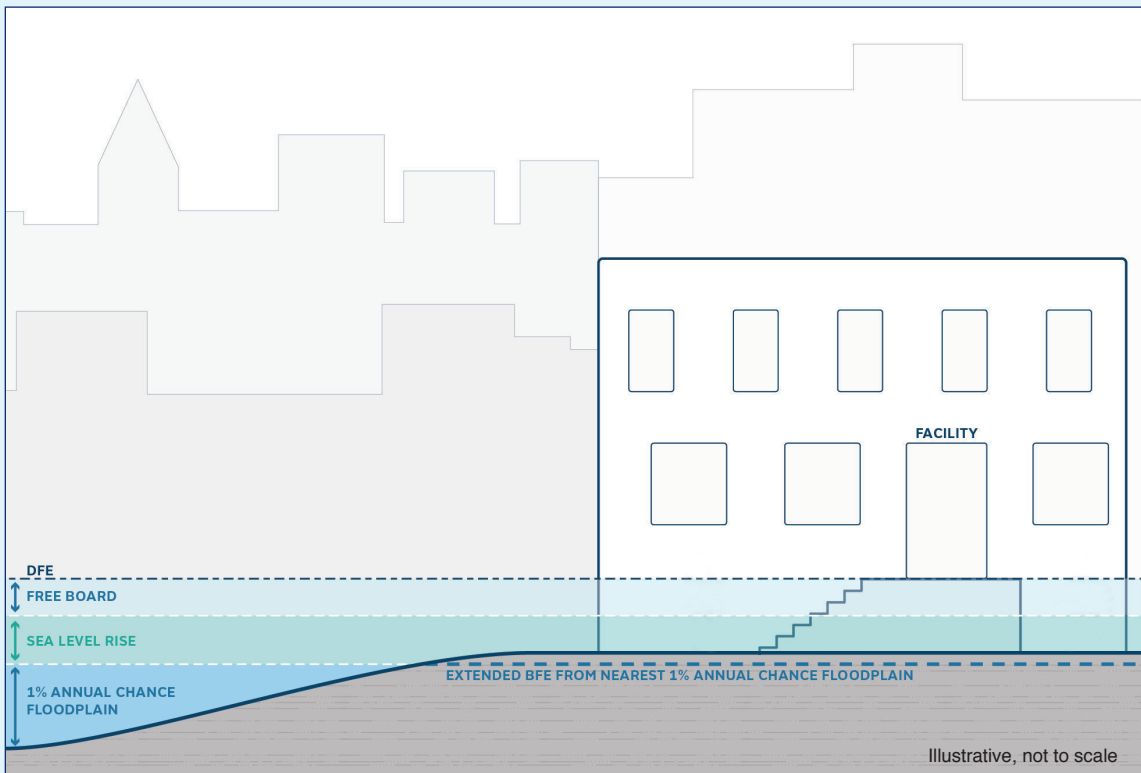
This schematic shows how to determine the design flood elevation of a facility that is outside of the current 1% floodplain.
